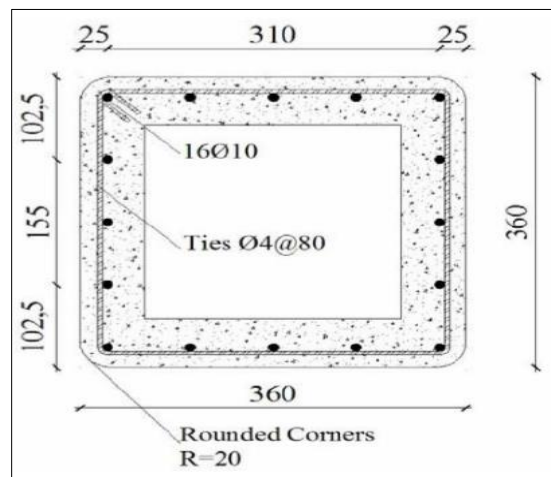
Detailing of hollow columns (Lignola et al., 2007).
